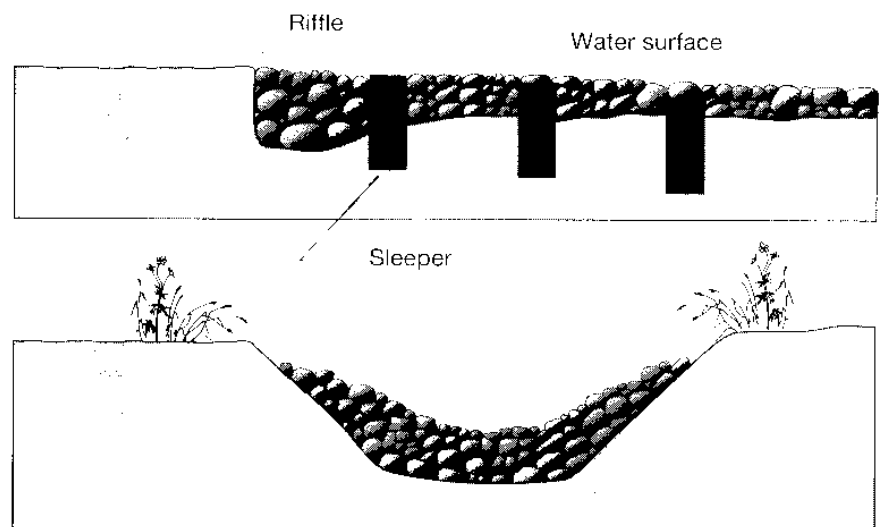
Illustration of how weirs are modified in Viborg County. Longitudinal section and cross section.
